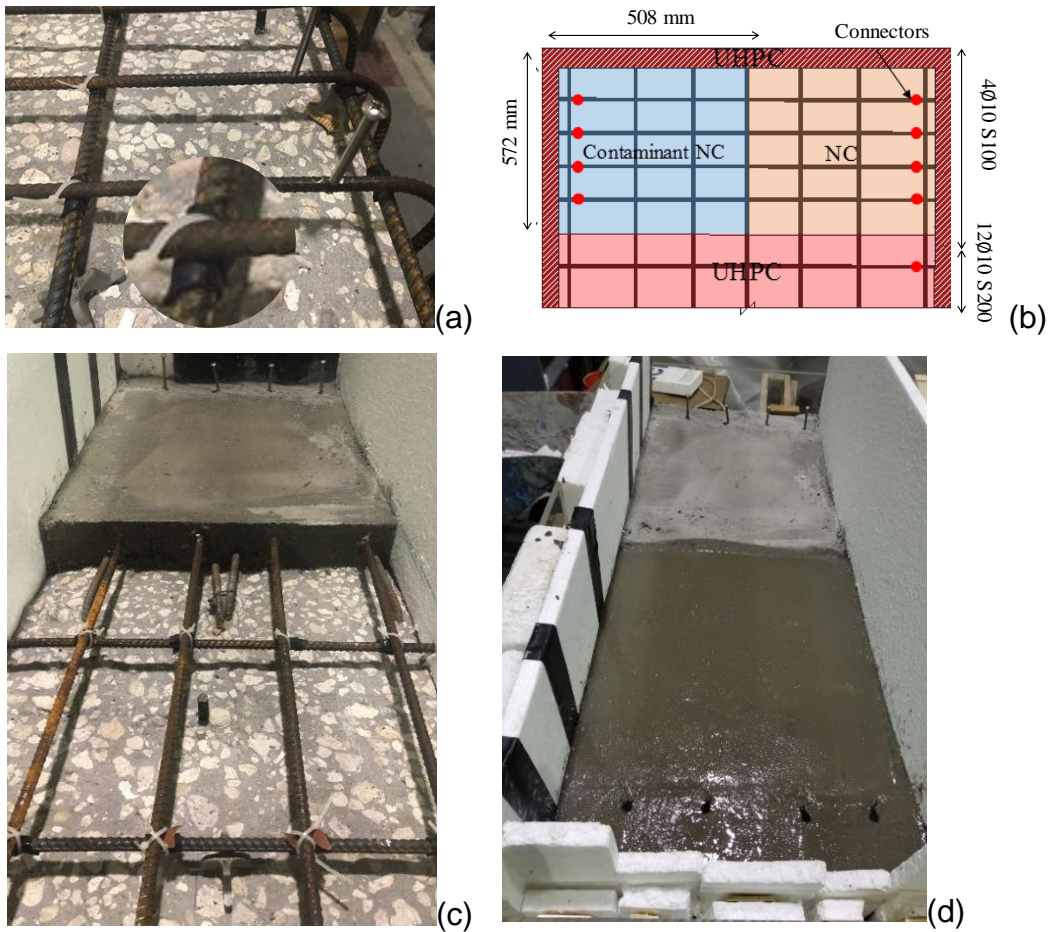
Local anodes in flange NC concrete segment of retrofitted T-beam specimen. (a) Electrical isolation of intersecting rebar and electrical connectors. (b) Schematic of NC section. (c and d) Cast NC sections with and without chloride contamination.
